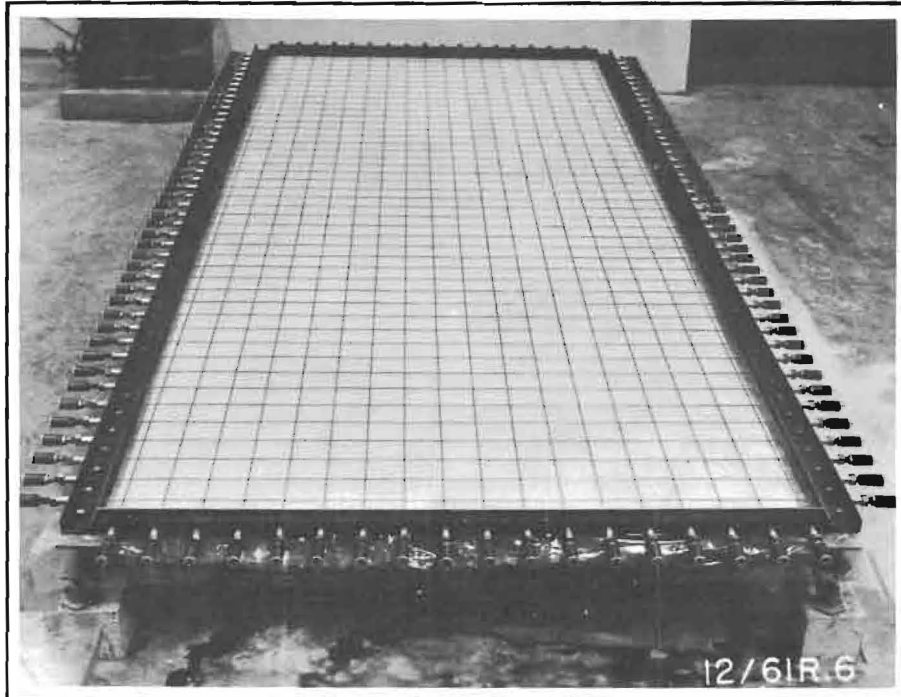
Completed installation of stressing wires spaced 4 inches center to center longitudinally and transversely. A polyethylene sheet was used to prevent the model slab from bonding to the casting bed.
